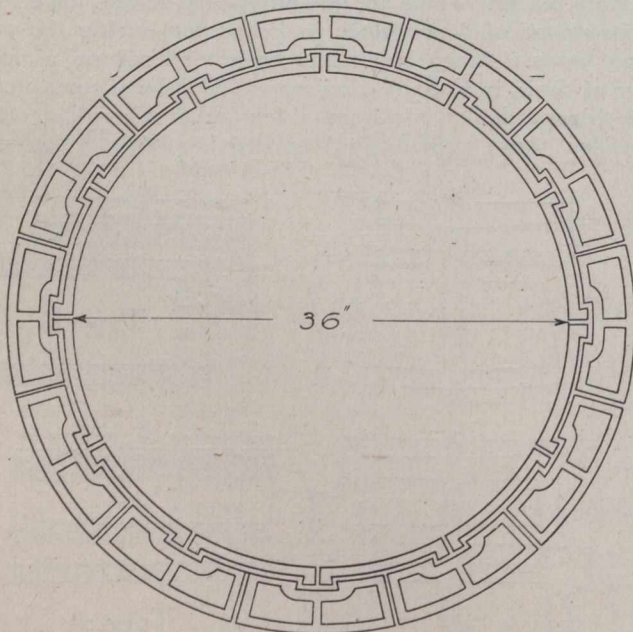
Cross-Section of Segmental Block Sewer, showing typical arrangement of outer and liner blocks.
